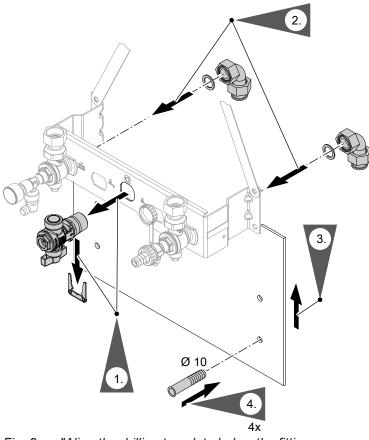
"Align the drilling template below the fitting assembly of the pre-plumbing jig."
